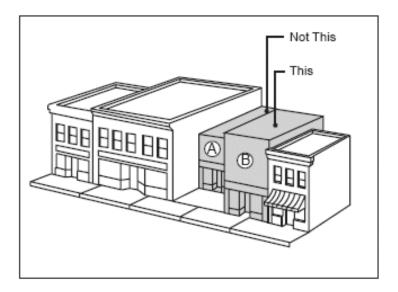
shows the desired placement of new buildings along the street to maintain continuity along the street edge. Building A creates a gap or break while Building B reinforces the edge along the public sidewalk.
